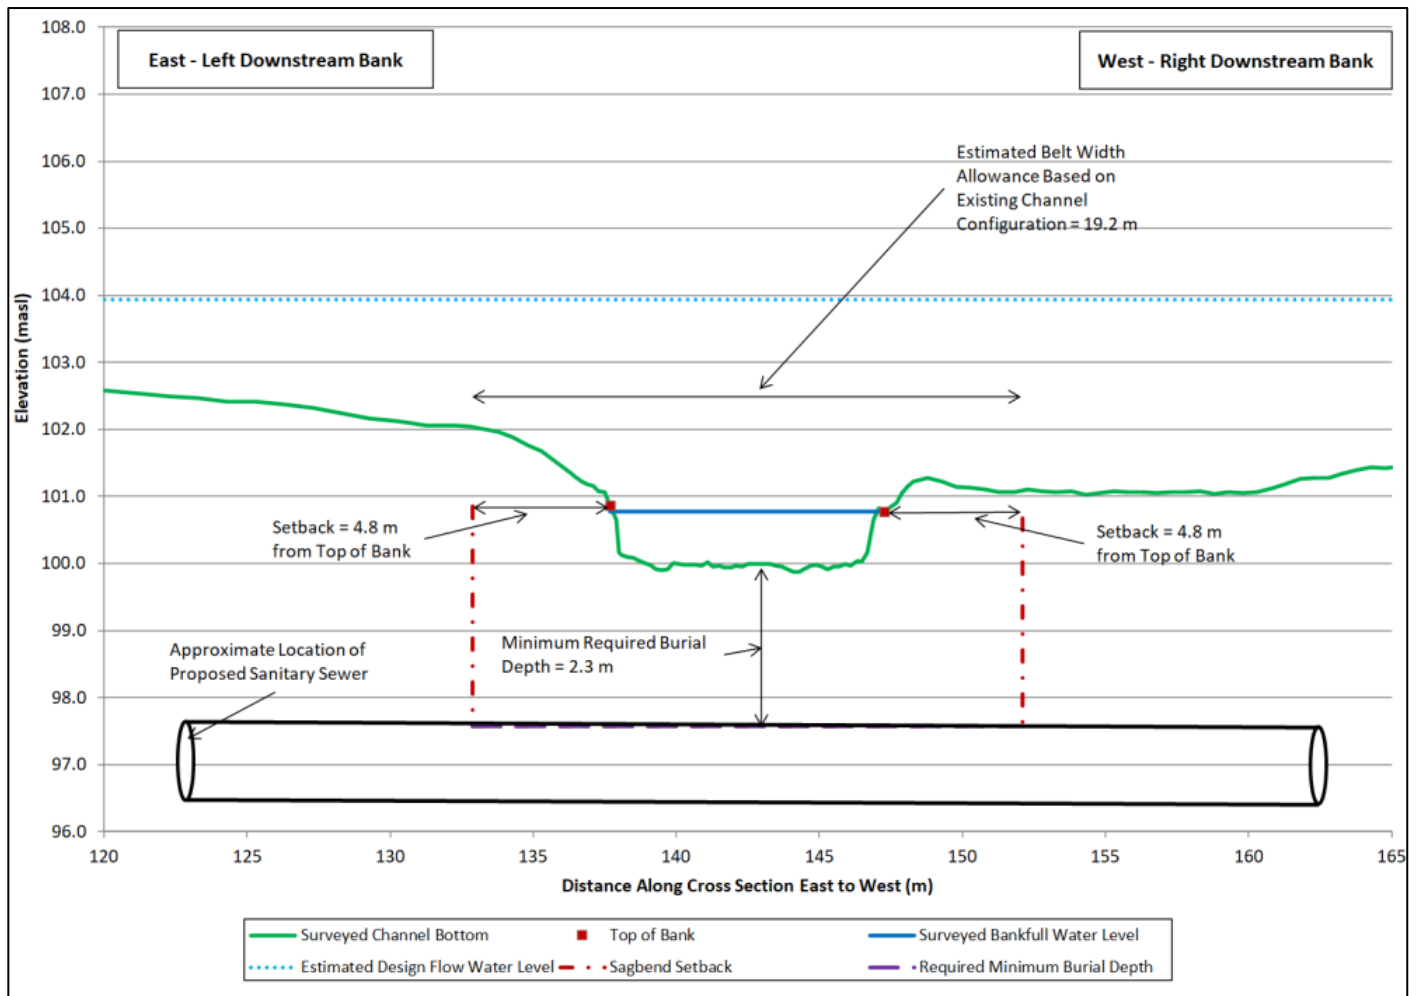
Cross Section for the Proposed Sewer Alignment Creek Crossing
